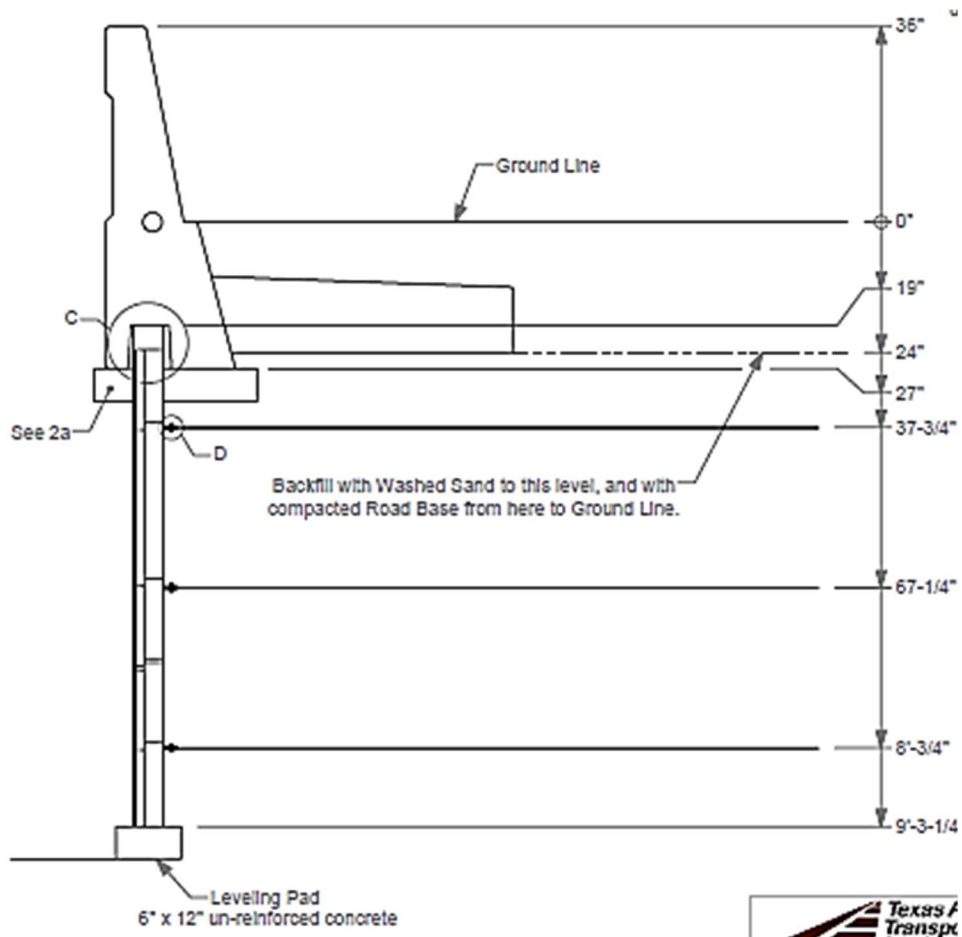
Side view of the TL-4 test wall installation with 36 in-high barrier
